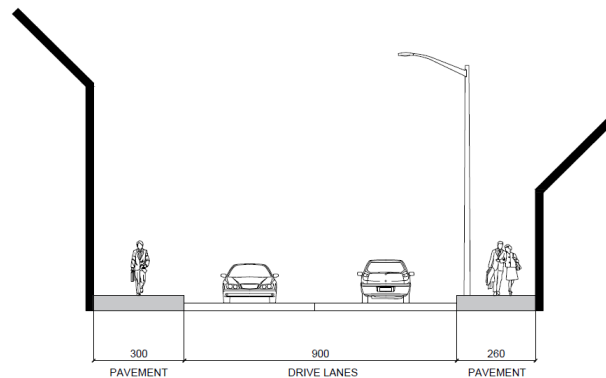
Street section – Długa street in Zgierz. Source: (Olczak, 2019).
